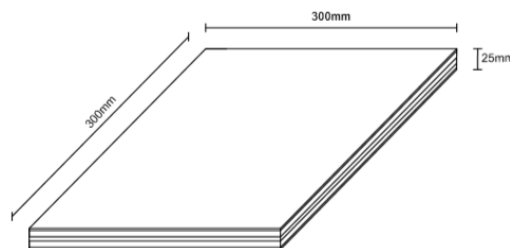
Shows the details on dimension of this Cellulose Drywall
